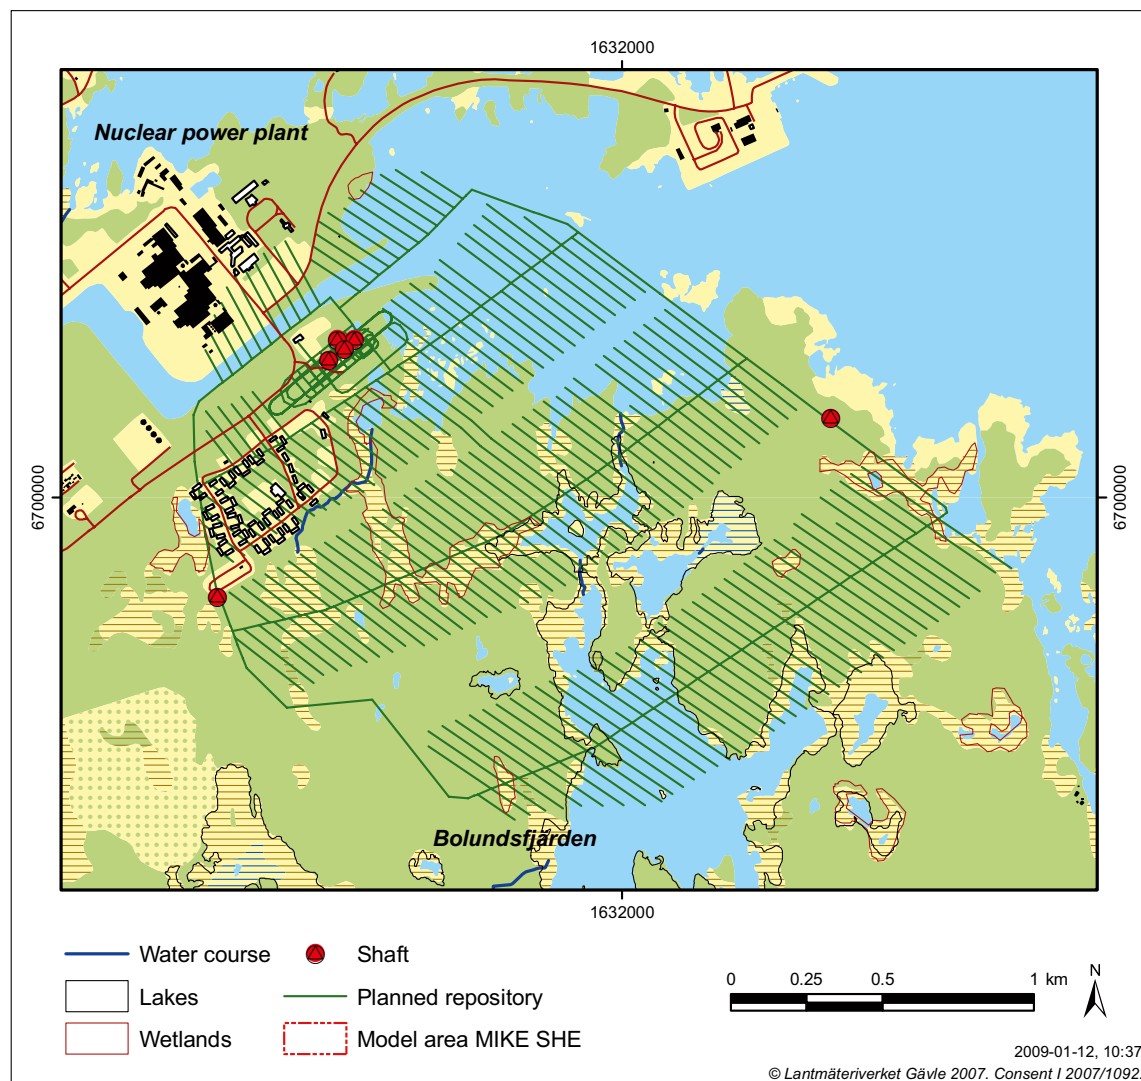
Positions of tunnels and shafts in the open repository (layout D2, version 1.0, April 2008).
